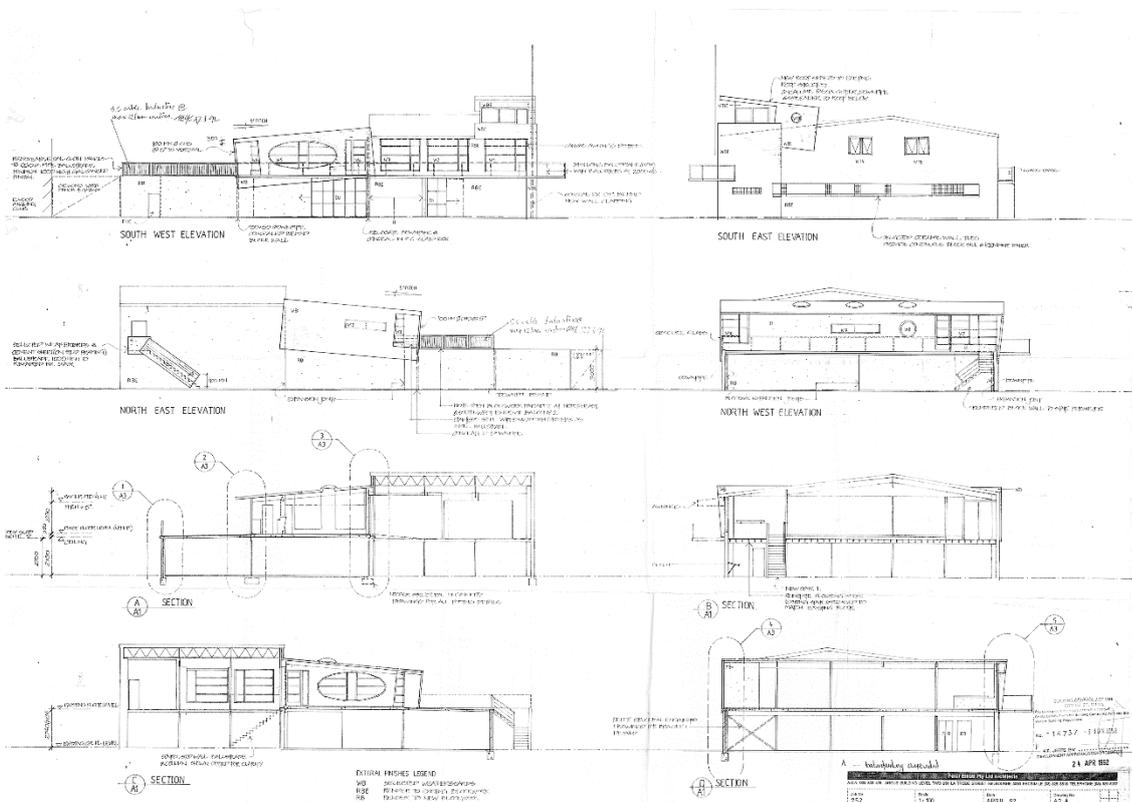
Elevations and sections from plans by Peter Elliott Architects, dated 1992. (Source: City of St Kilda)
